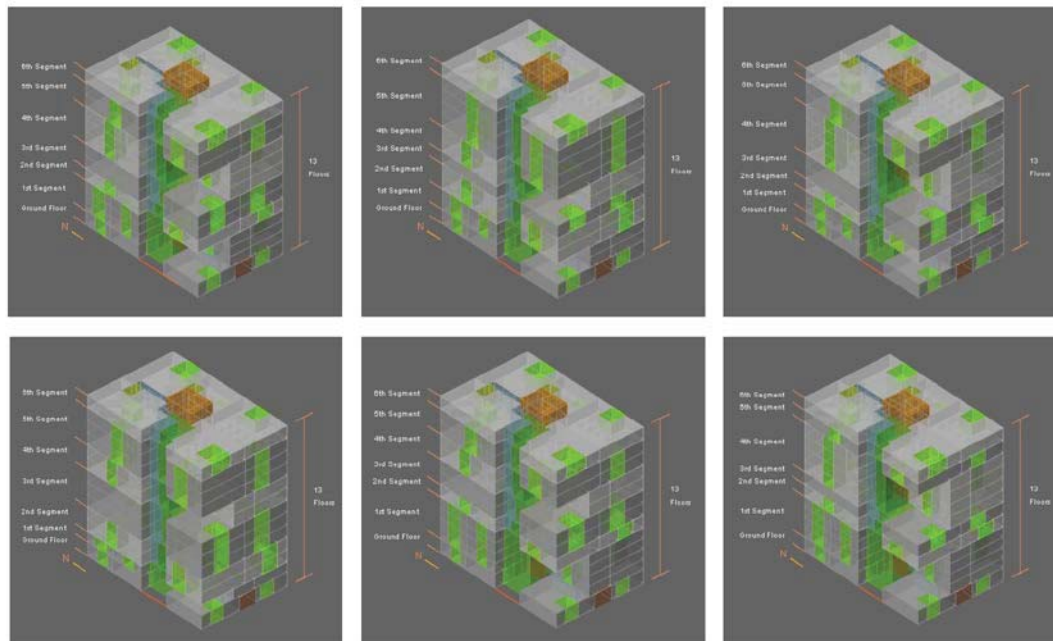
Six different alternatives for a 13-floor residential building generated by the developed parametric grammar, through changing number of floors on each segment of the building (Authors)
